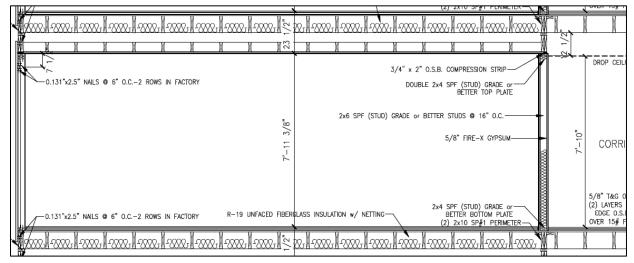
Modular Section Plan from Sheet A1.2C – Architectural Plans -WTW Architects
